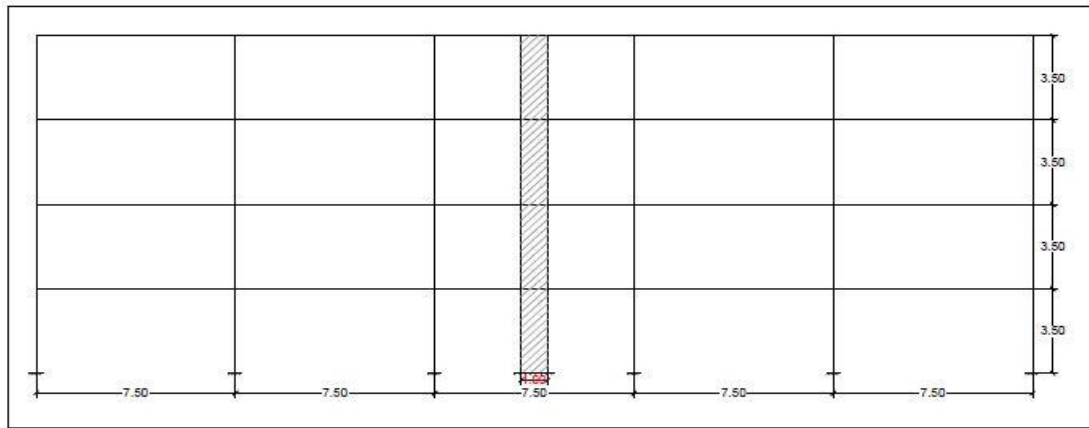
Elevation of 4-story building with steel plate shear walls having aspect ratio of 0.285 (Model 1)
